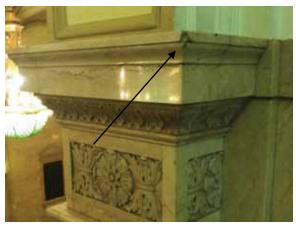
C.13 Typical minor damage to polished stone wainscoting.
